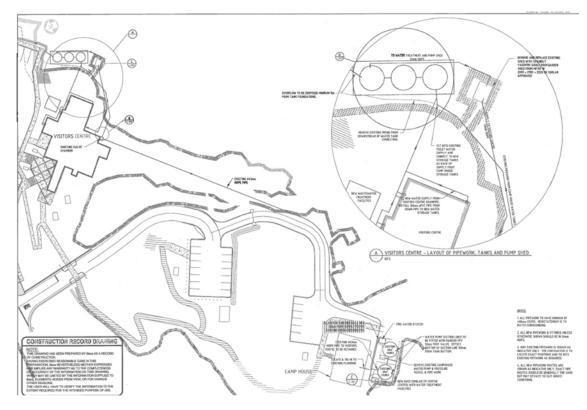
Water supply upgrade layout drawing (Beca drawing 3851842-C-200, rev. 2)
